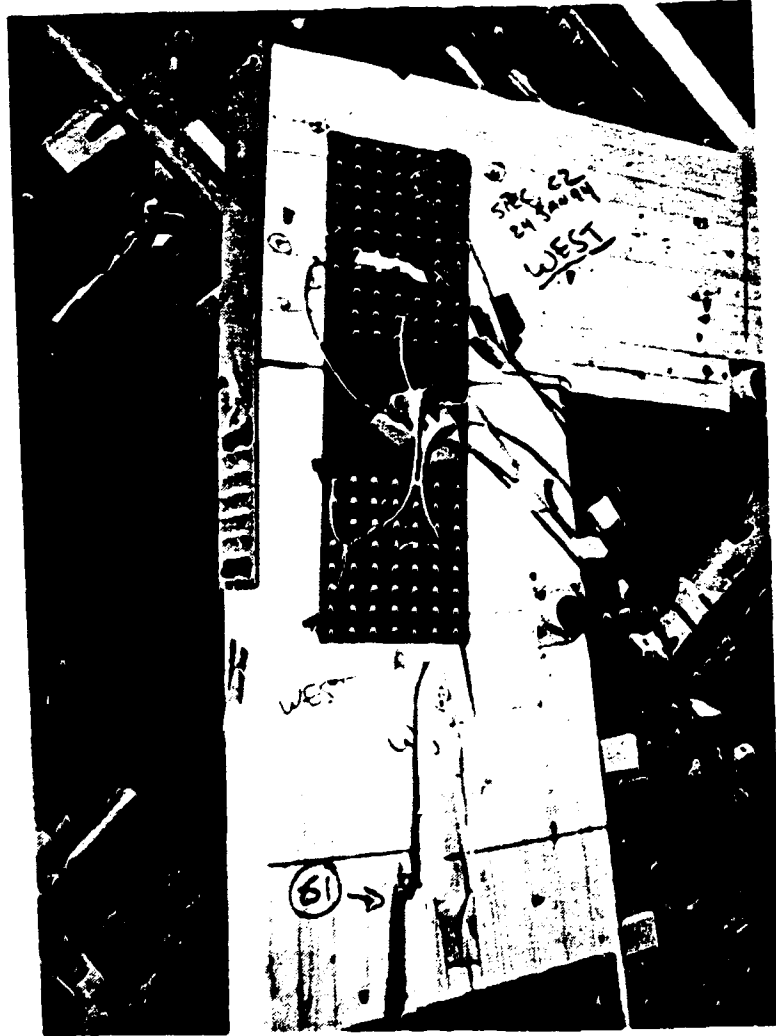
Brittle Fracture through Member at Bracket Bolts (Specimen C2)
